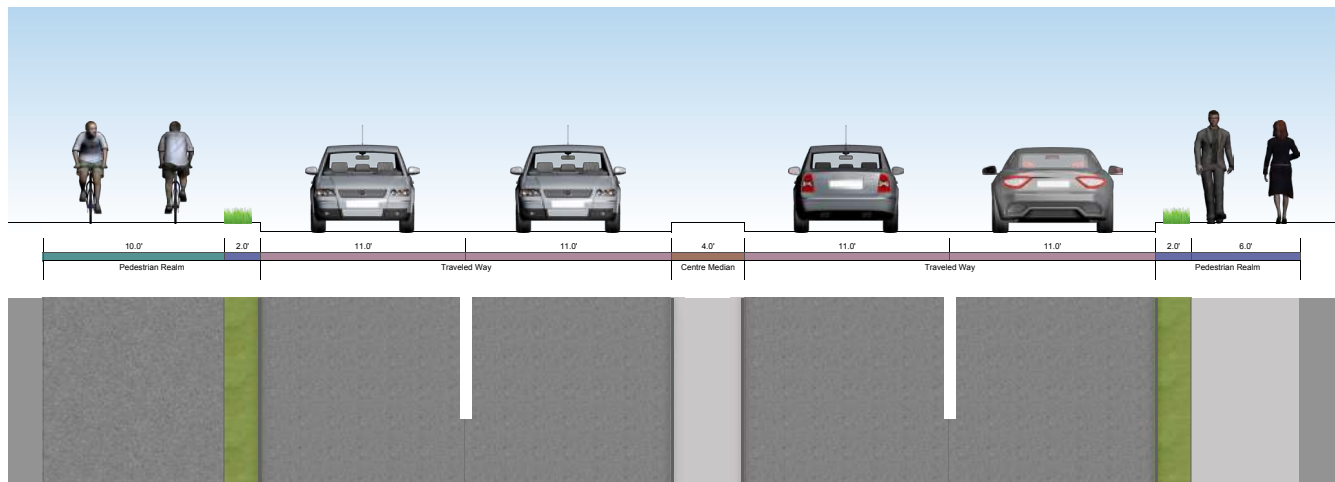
Woolford Road/Central Avenue Cross-Section C (68')
